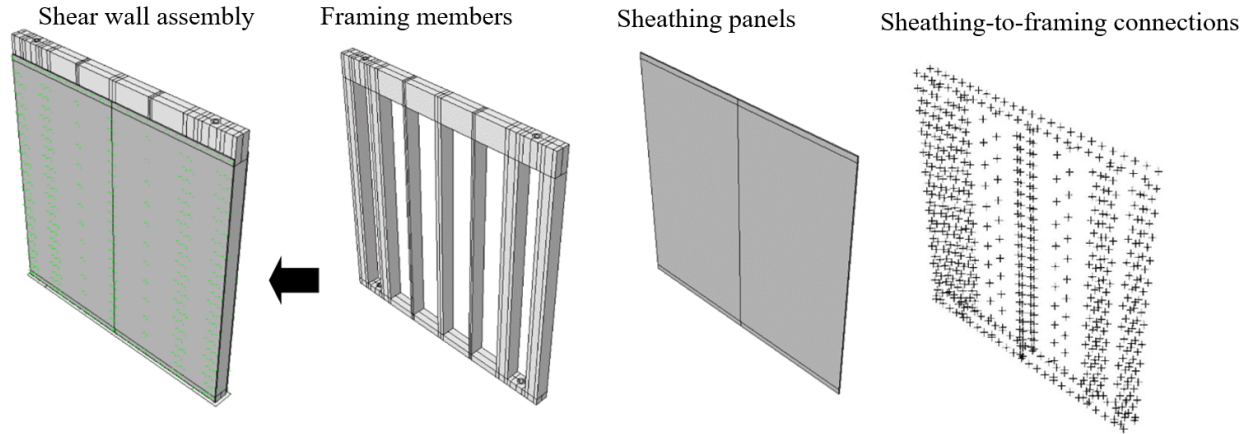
Three main components of a light-frame wood shear wall: (a) framing members, (b) sheathing panels, and (c) sheathing-to-framing connections.
